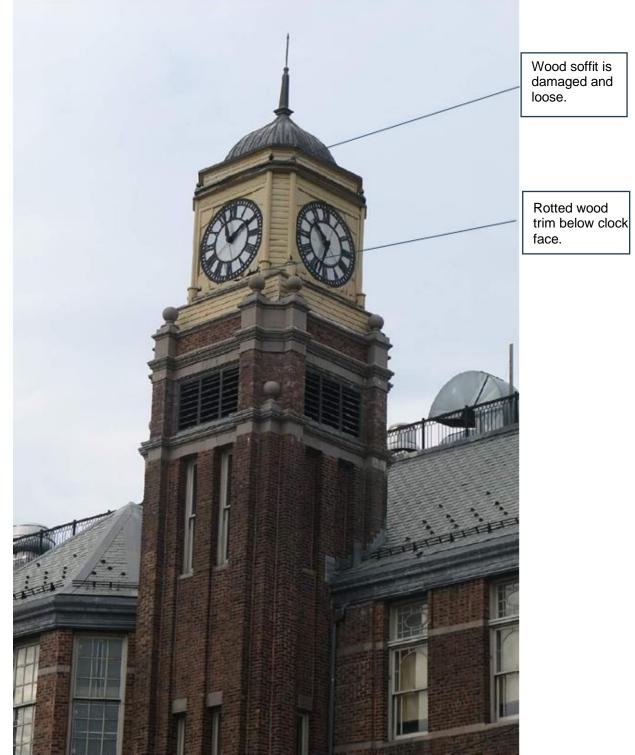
North Elevation. Damage to cupola and wood trim and siding. Masonry tower in good condition.
